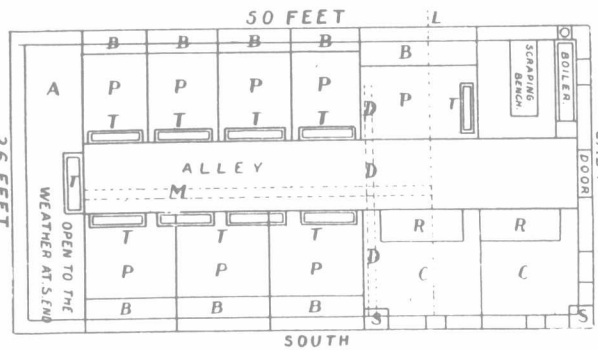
FIG. I.—GROUND-FLOOR PLAN OF F. J. COLLYER'S PIGGERY AND HENNERY.
